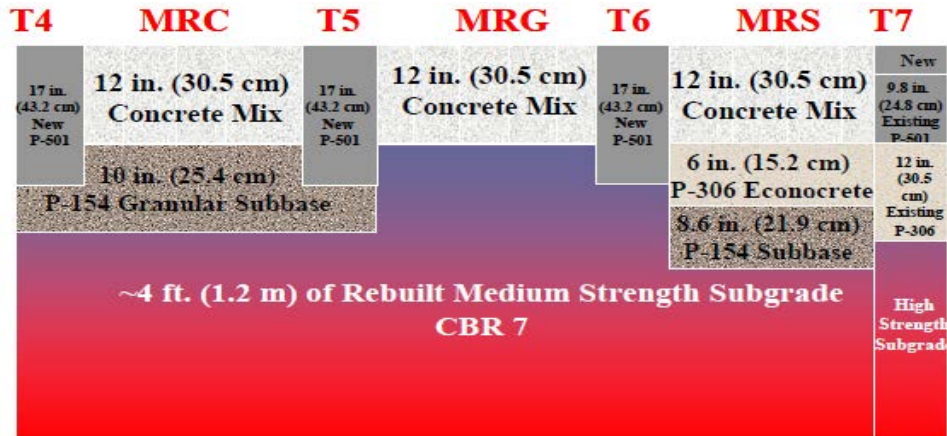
Section view of CC2 test pavement (Ricalde, Daiutolo, 2004)
